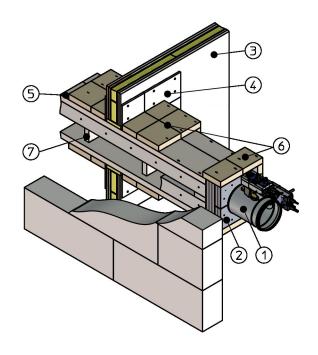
Installation remote from lightweight partition walls, wall penetration, cladding on four sides
